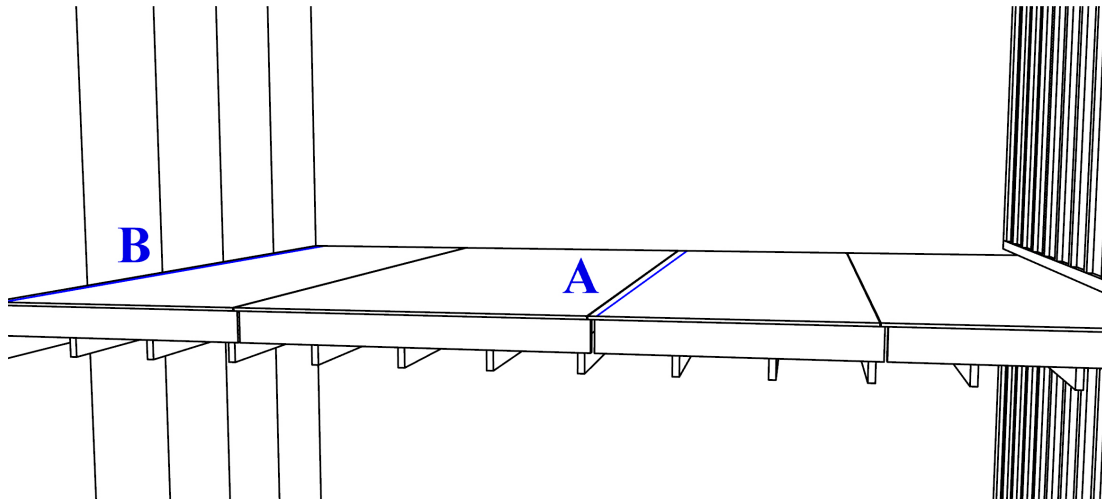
Floor structure. Attachment between floor elements (A) and attachment along the edge of the floor (B) to the exterior wall.
